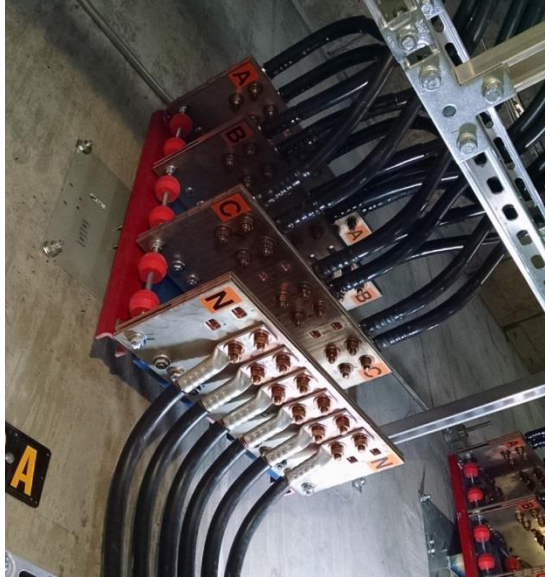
Bus Bars Parallel to Floor, Plan View (Cables Parallel to Floor)
